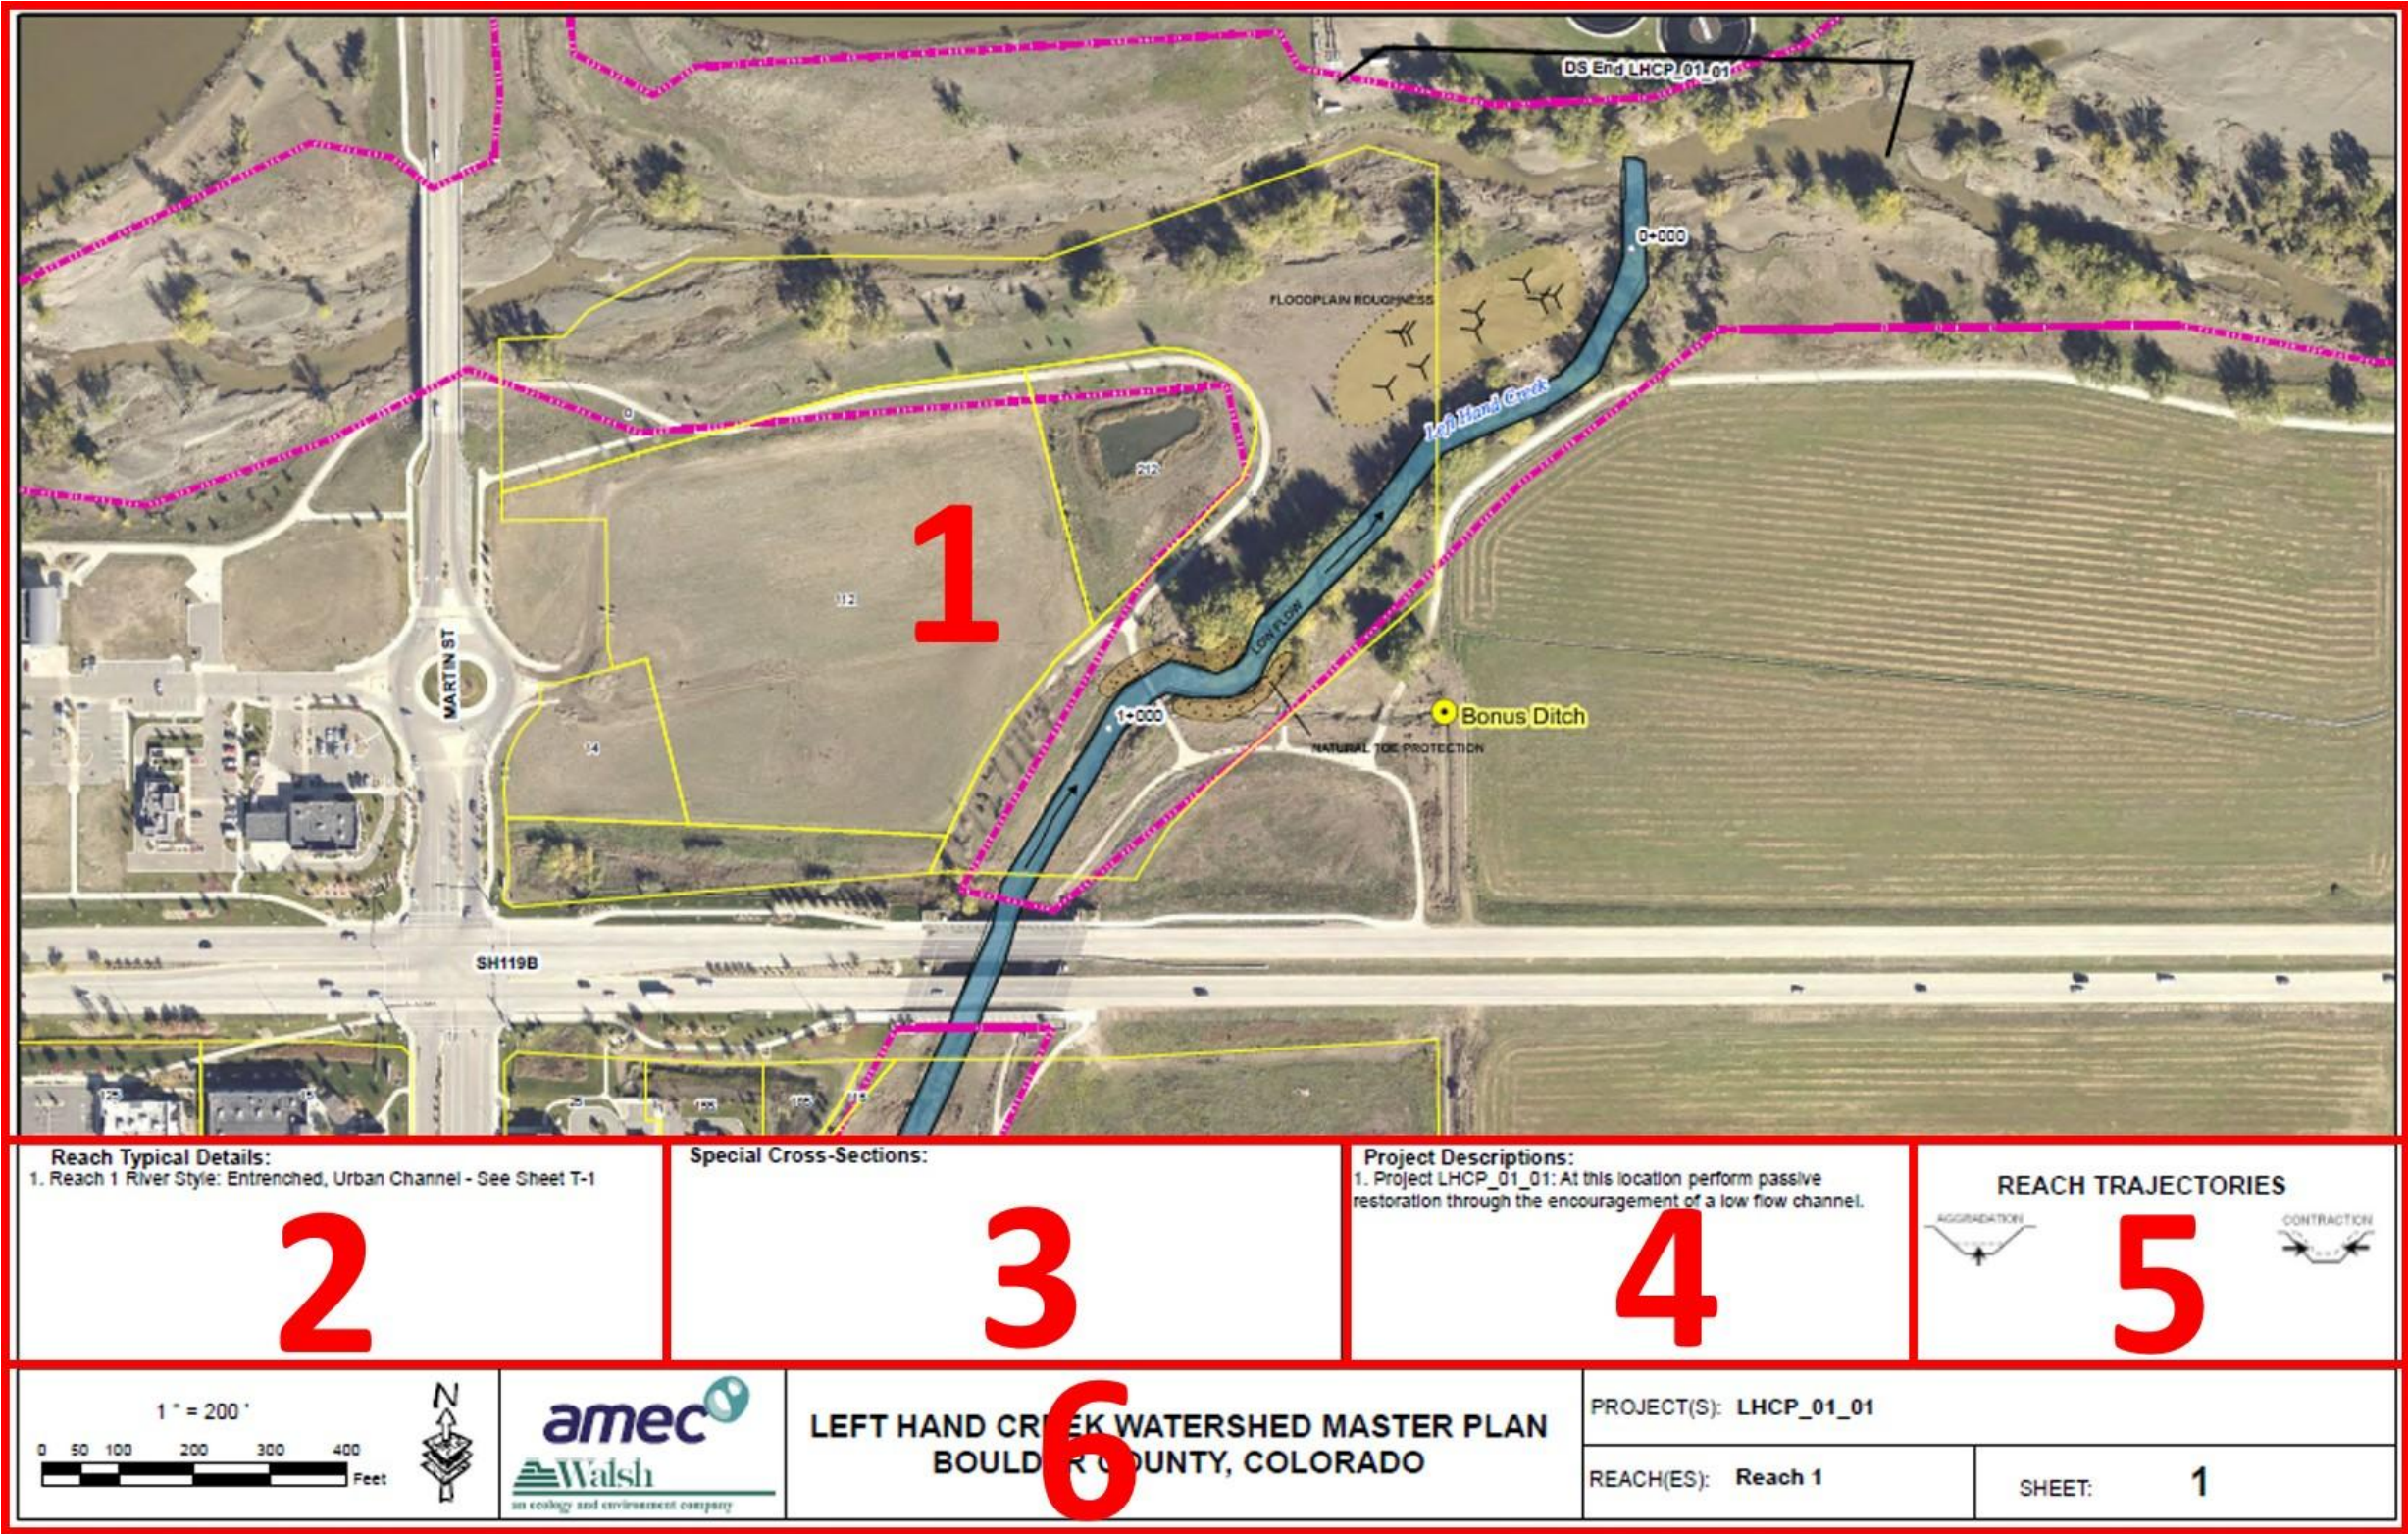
Example layout with annotations identifying the sections of the plan sheets.
